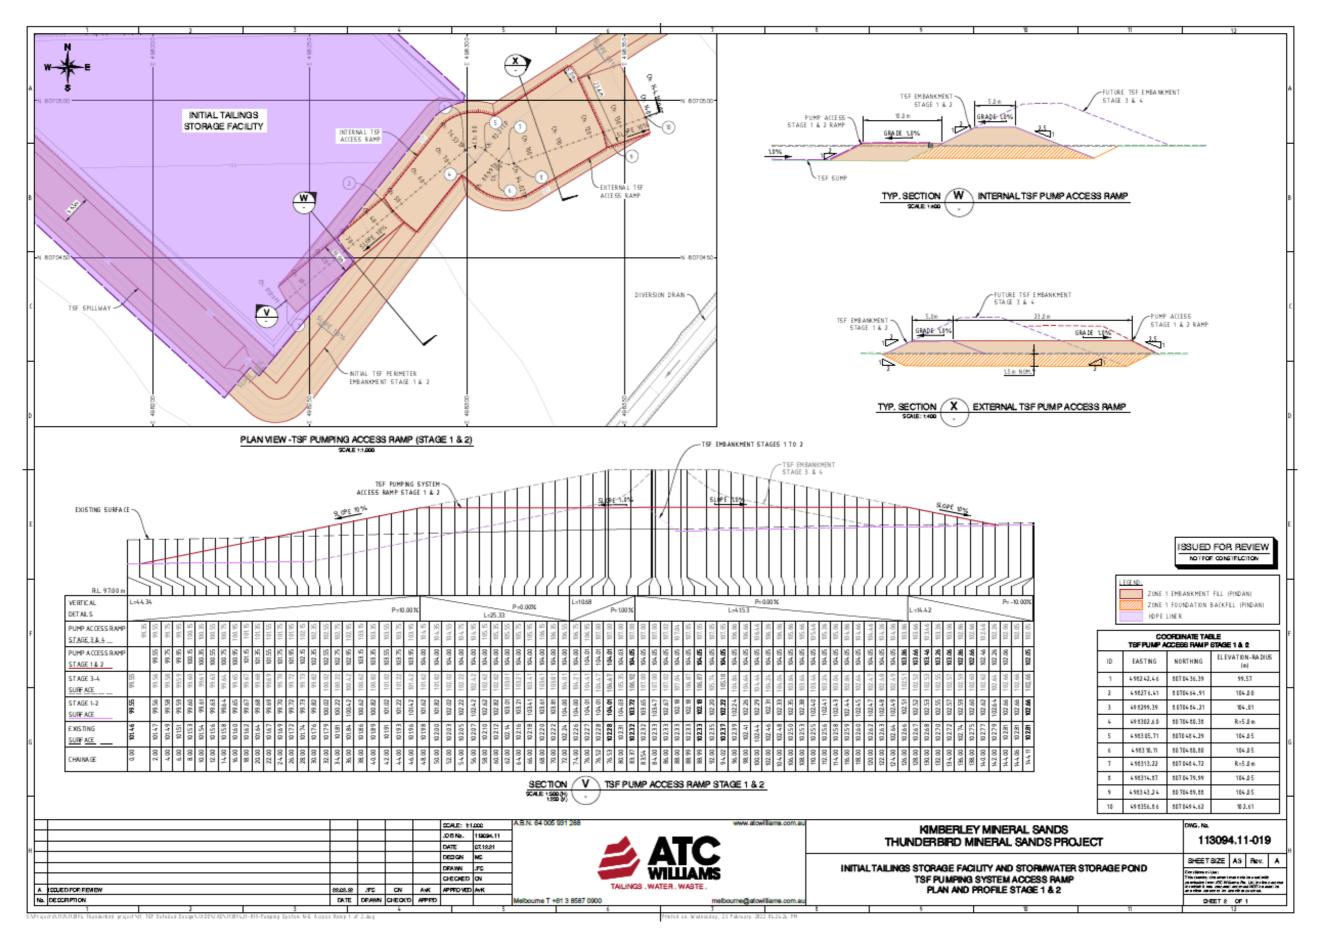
Drawing – Initial TSF and SPP, TSF pumping system and access ramp, plan and profile stages 1 and 2
